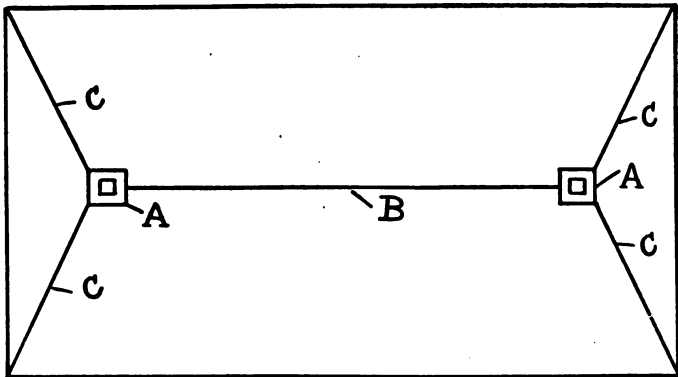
Plan of Roof on Which Masts for Supporting Aerials Are Elevated.
